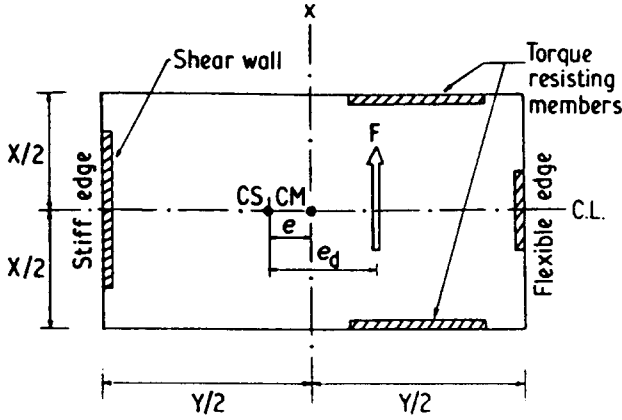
Floor plan of a typical mono-symmetric building as considered by building codes.
